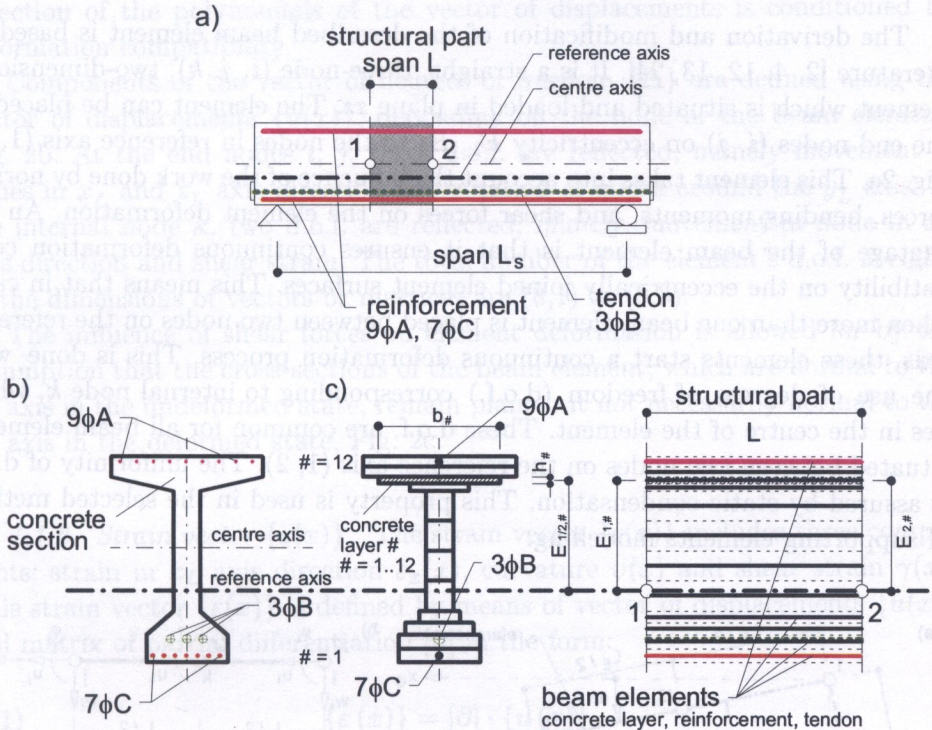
Structure modelling – longitudinal section (a), real cross-section (b), cross-section and longitudinal section in case of the use of "adapted layered" approach (c).
